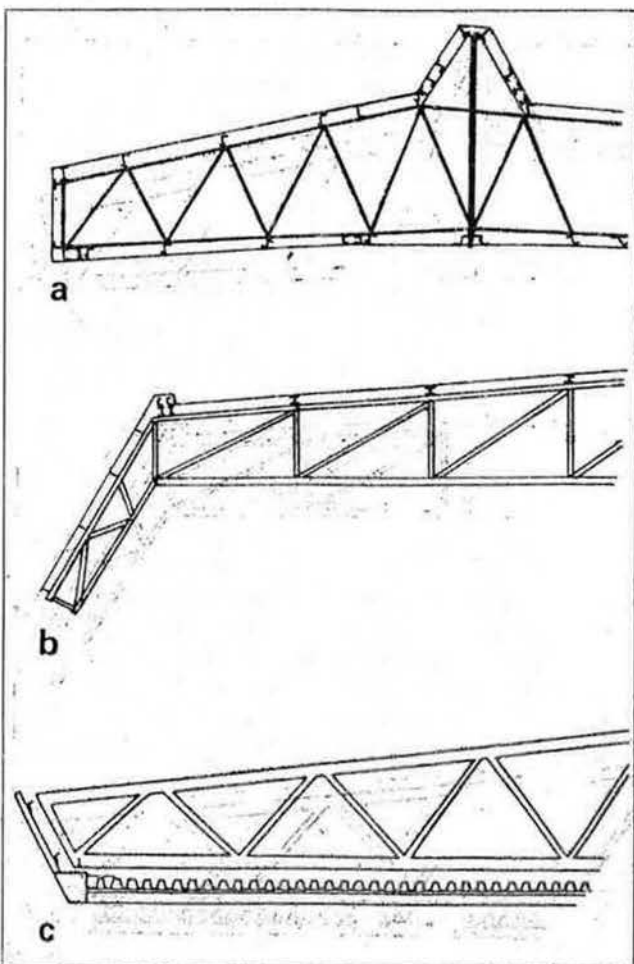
Typical roof details: (a) Ibrox Park, Glasgow - East and West stands; (b) PSV, Eindhoven - main stand; (c) Murrayfield, Edinburgh - East stand
